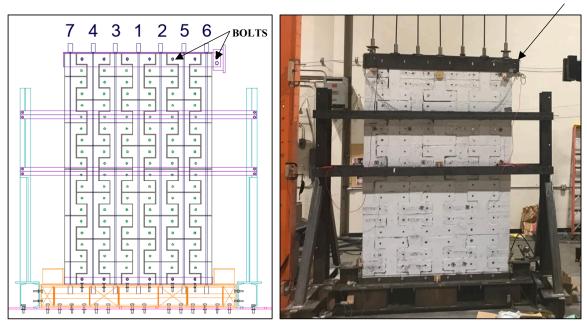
Elevation drawing of wall with strands and initial design for steel cap connection (left); Photograph of completed wall with post-tensioning installed, as well as modified steel cap (right).
